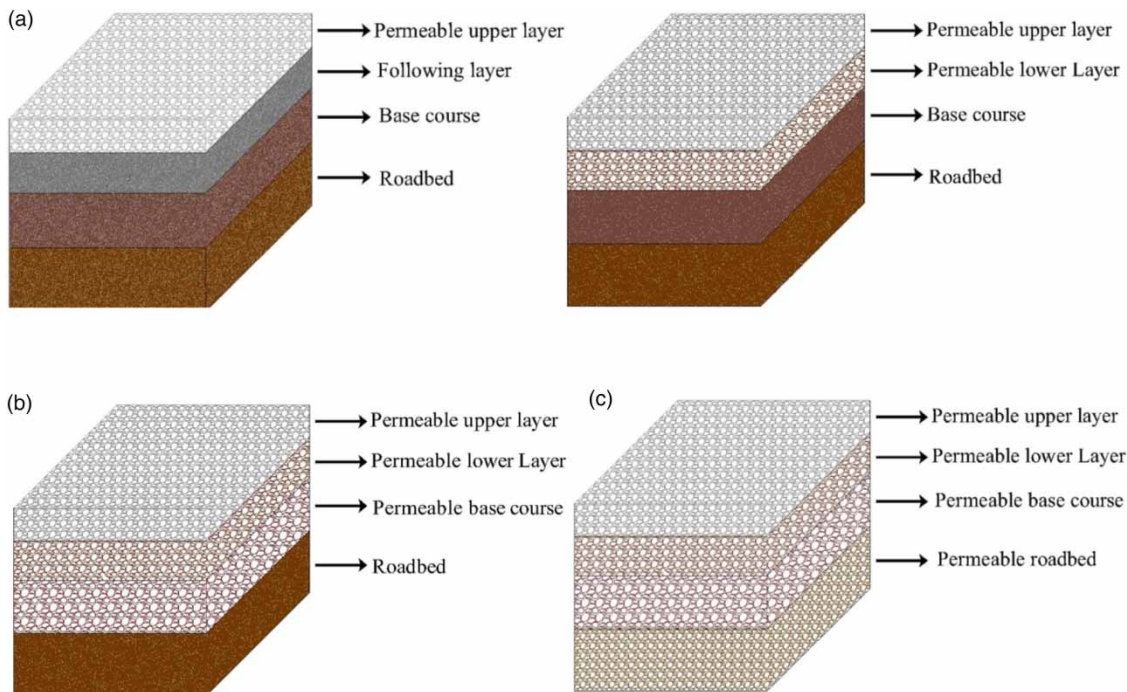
| Typical structure of permeable asphalt pavement. (a) Drainage surface layer asphalt pavement (single layer, double layer). (b) Permeable road type asphalt pavement. (c) Permeable road asphalt pavement.
